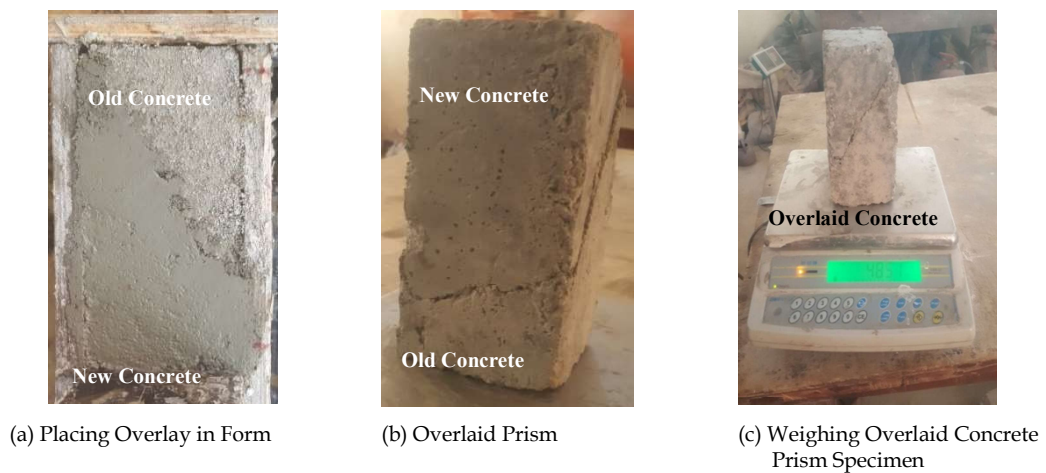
Overlaid Concrete Prism Specimen for Interfacial Bond testing
